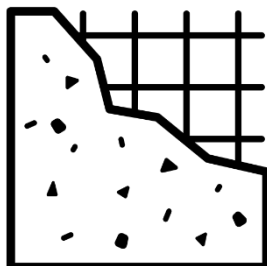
Minimum 10 mm Reinforcing Bars Embedded in Brick Masonry
